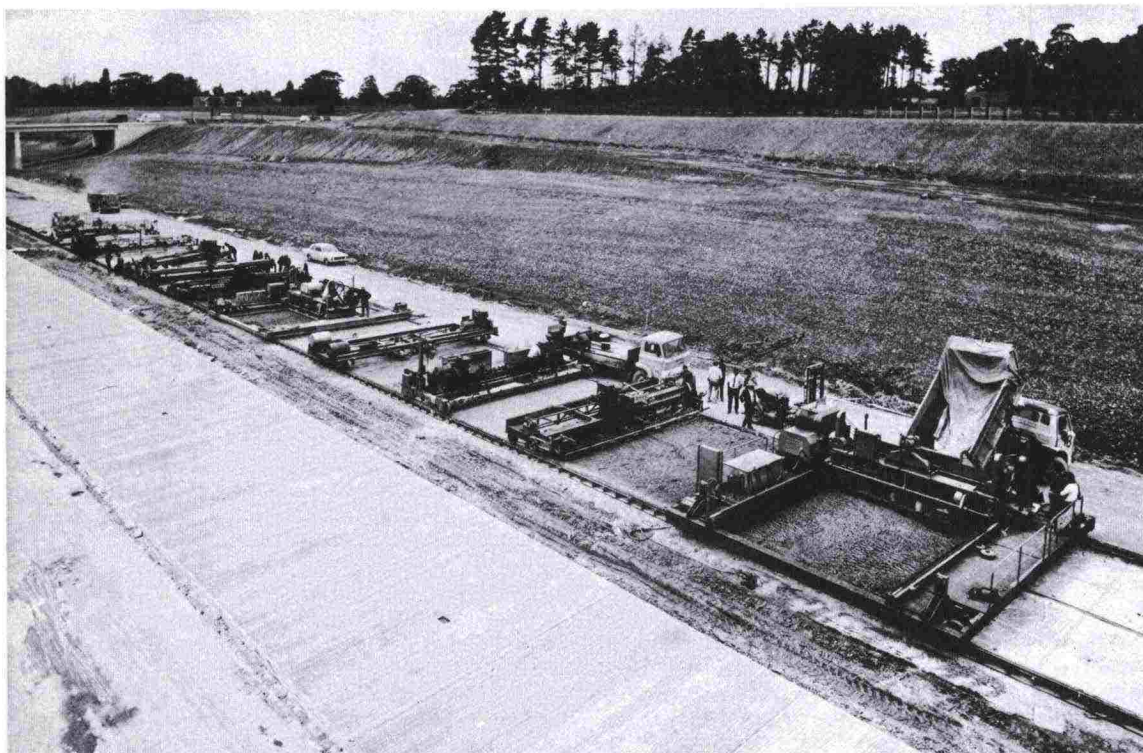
Concrete pavement under construction using the fixed-form method /14/
